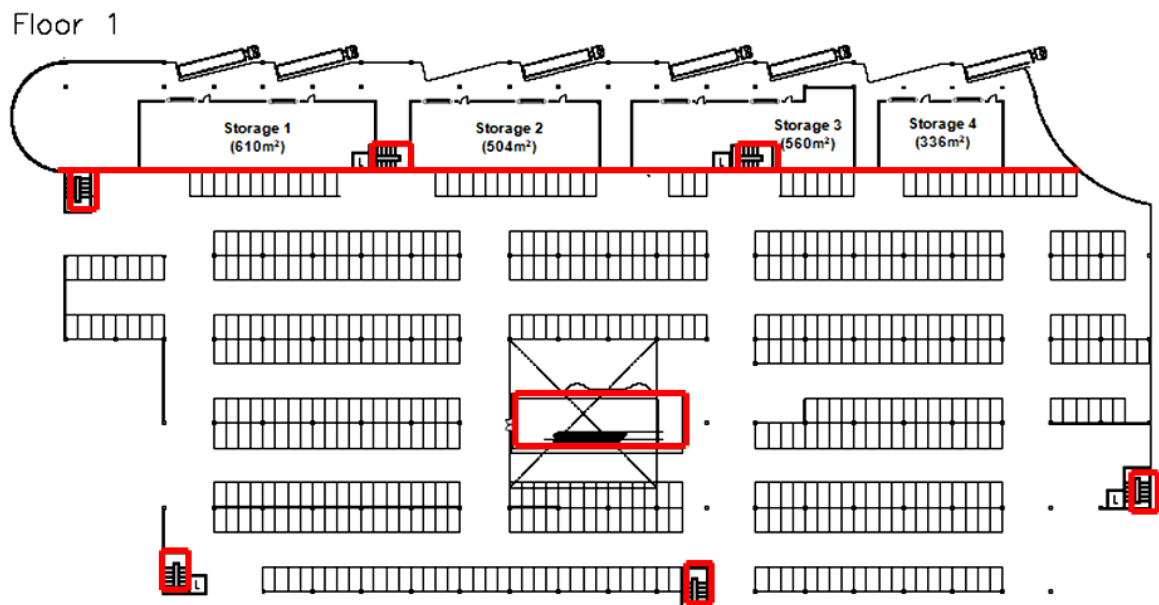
Firecell separation of the proposed shopping mall on Floor 1
